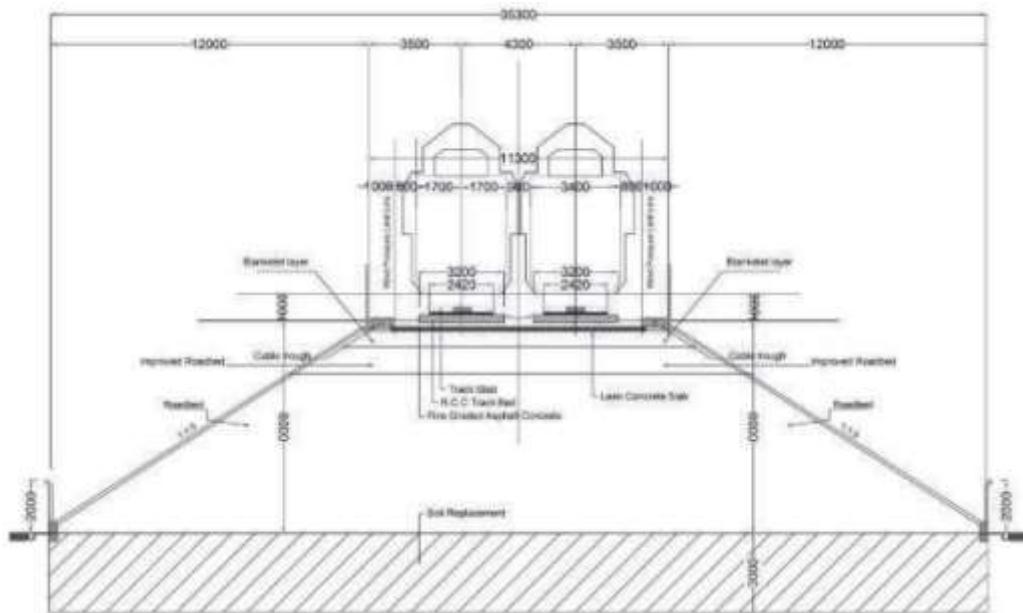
Cross-section of embankment - Mumbai - Ahmedabad HSR
